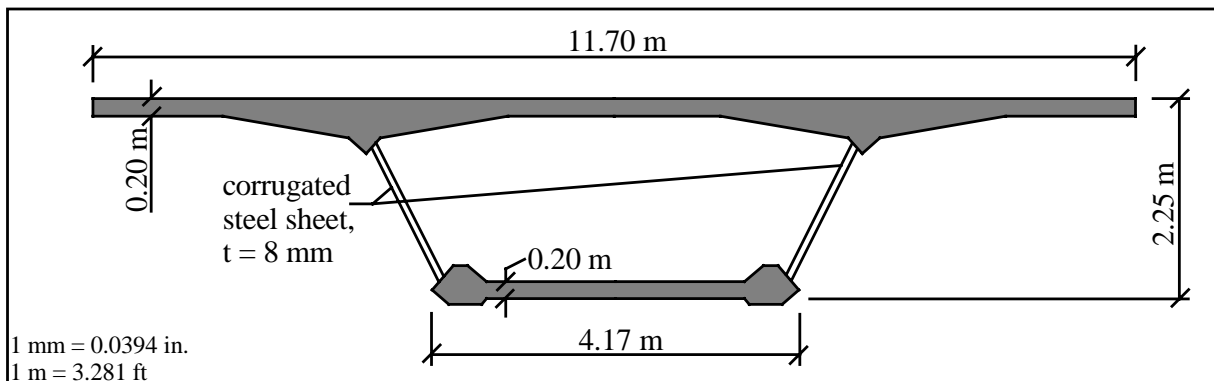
Bridge at Cognac, France - Typical mid-span section.
